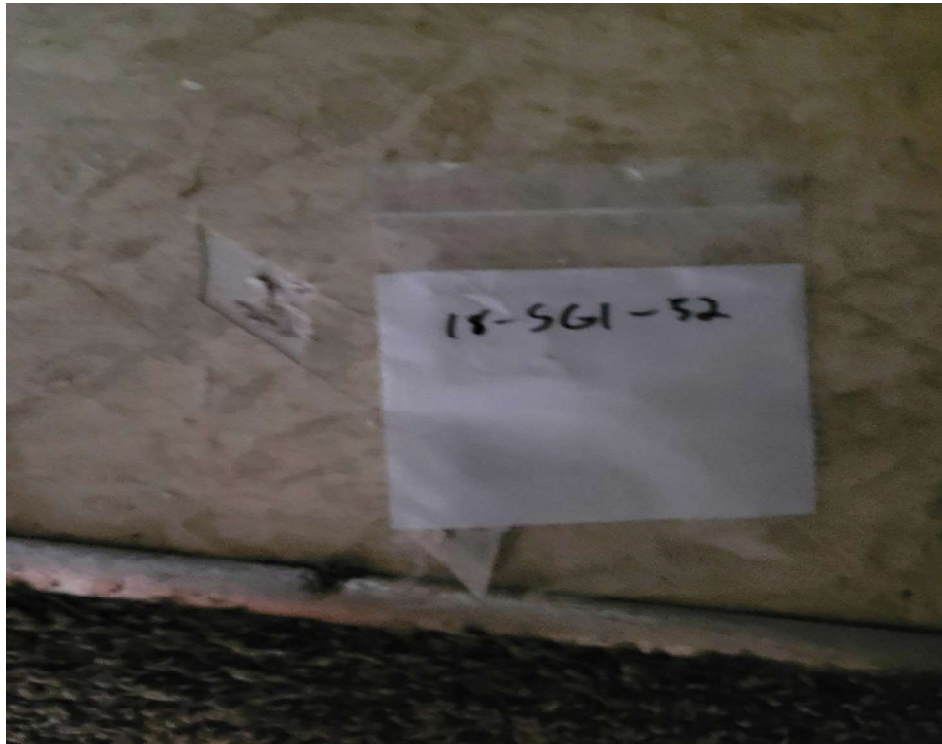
View of positive vinyl sheet flooring 2 layers in building 211 2<sup>nd</sup> floor south end apartment kitchen.
